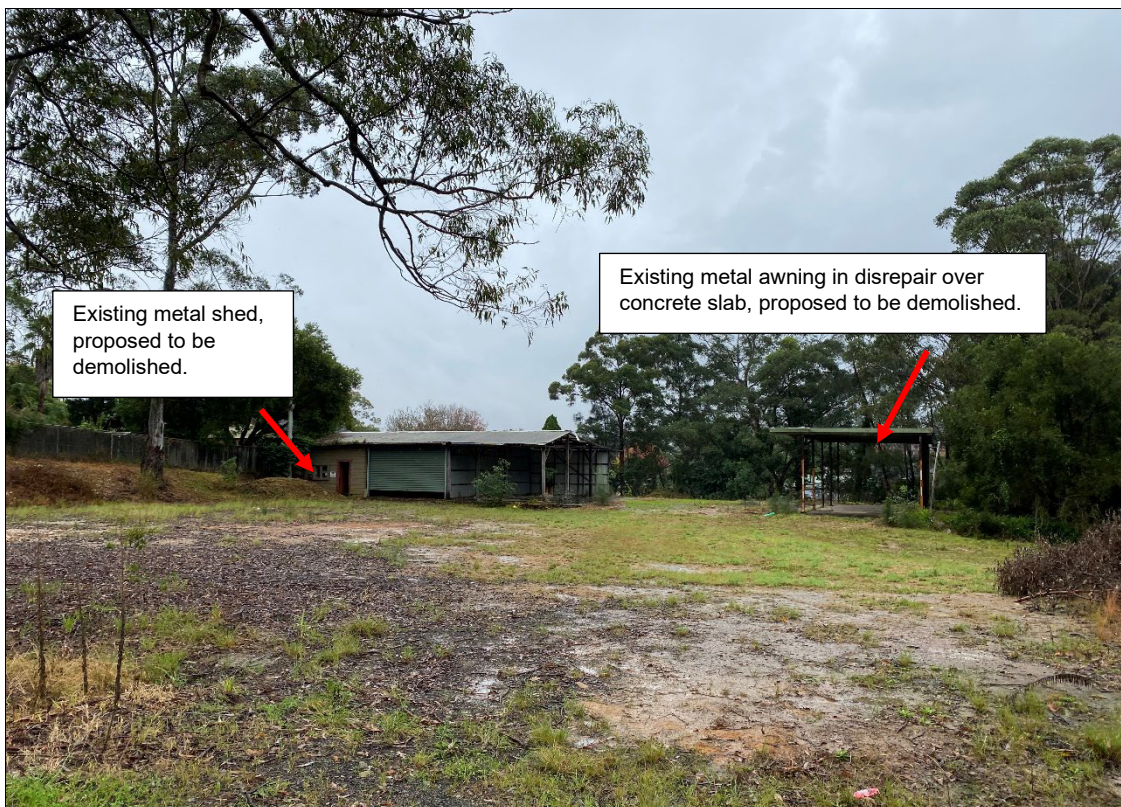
Looking North from Murray Farm Road. Source: Site Inspection.
